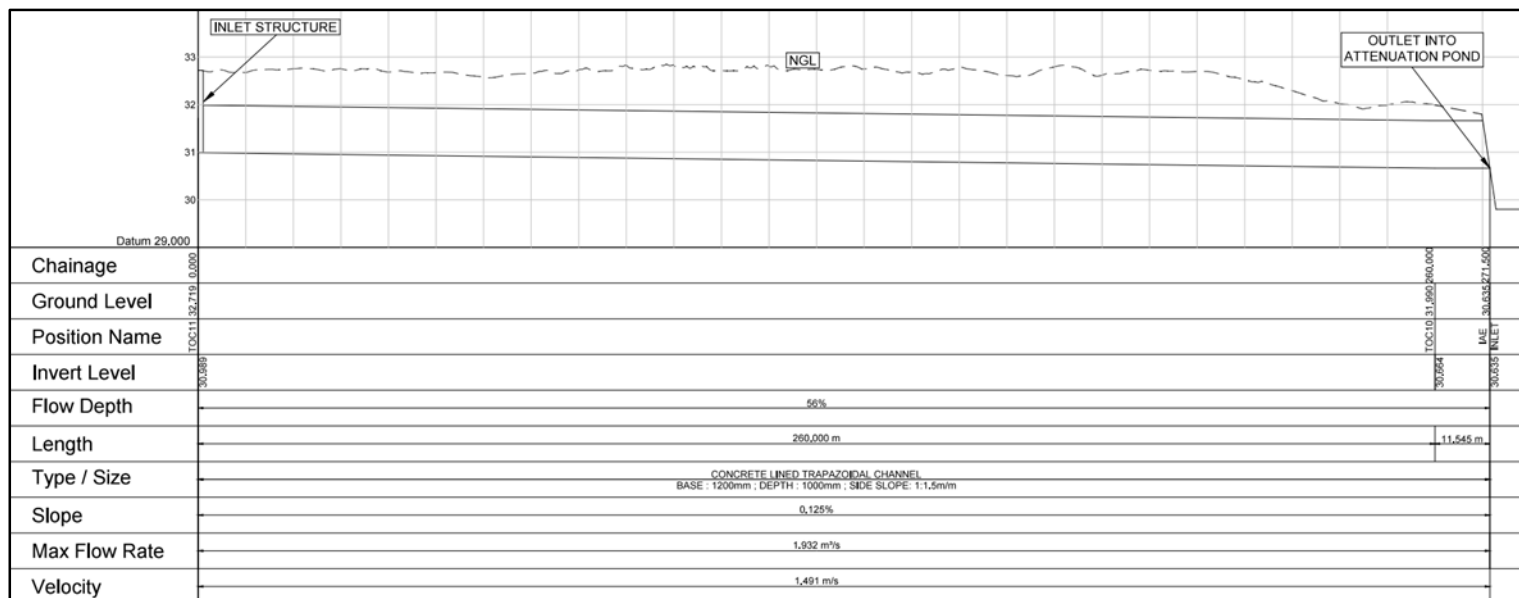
Long section of proposed new stormwater infrastructure between TOC11 and TOC10.
